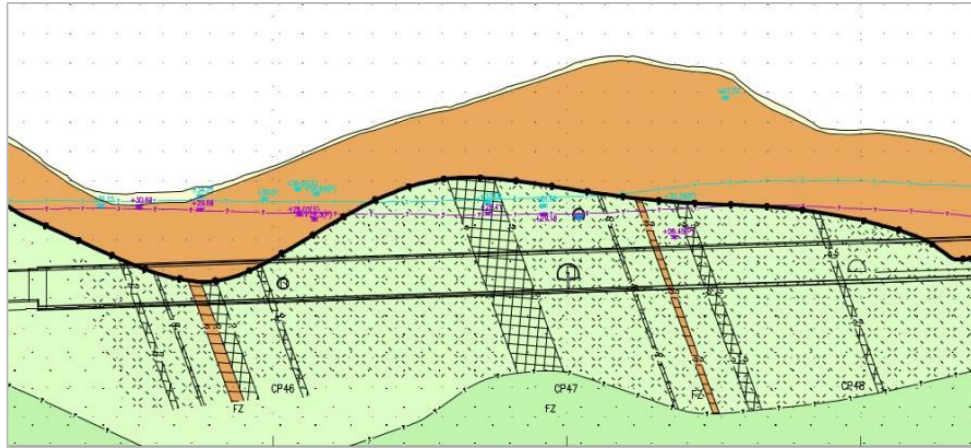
Geological profile of SFRC tunnel lining section in Liantang Project
